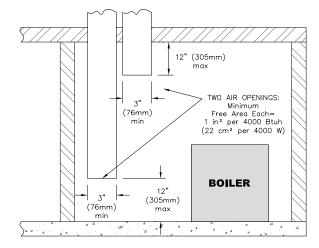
Air Openings – All Air from Outdoors through Vertical Ducts
